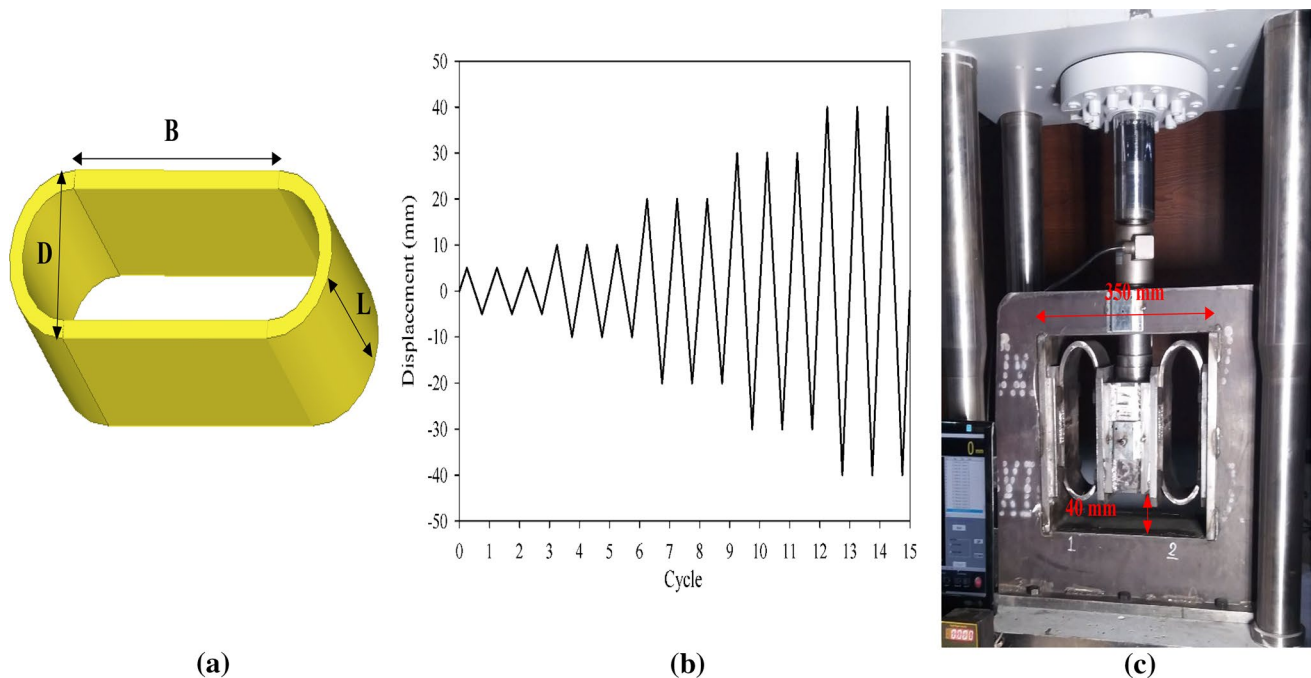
Schematic view of the damper: a geometrical parameters, b loading protocol, and c experimental test setup using uni-axial testing machine
